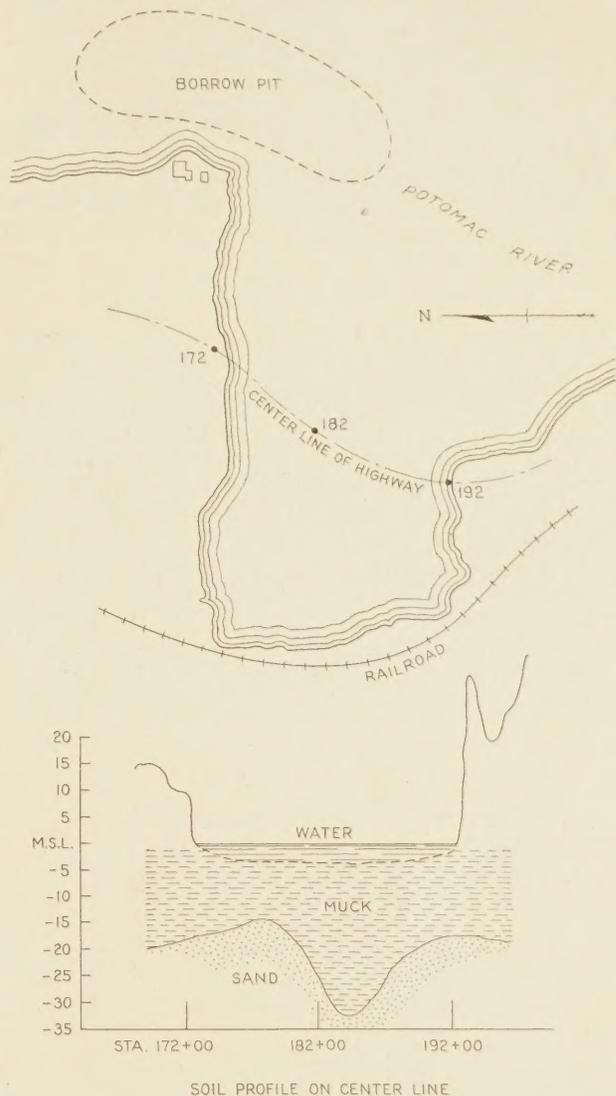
PLAN AND SOIL PROFILE AT FOUR MILE RUN.
